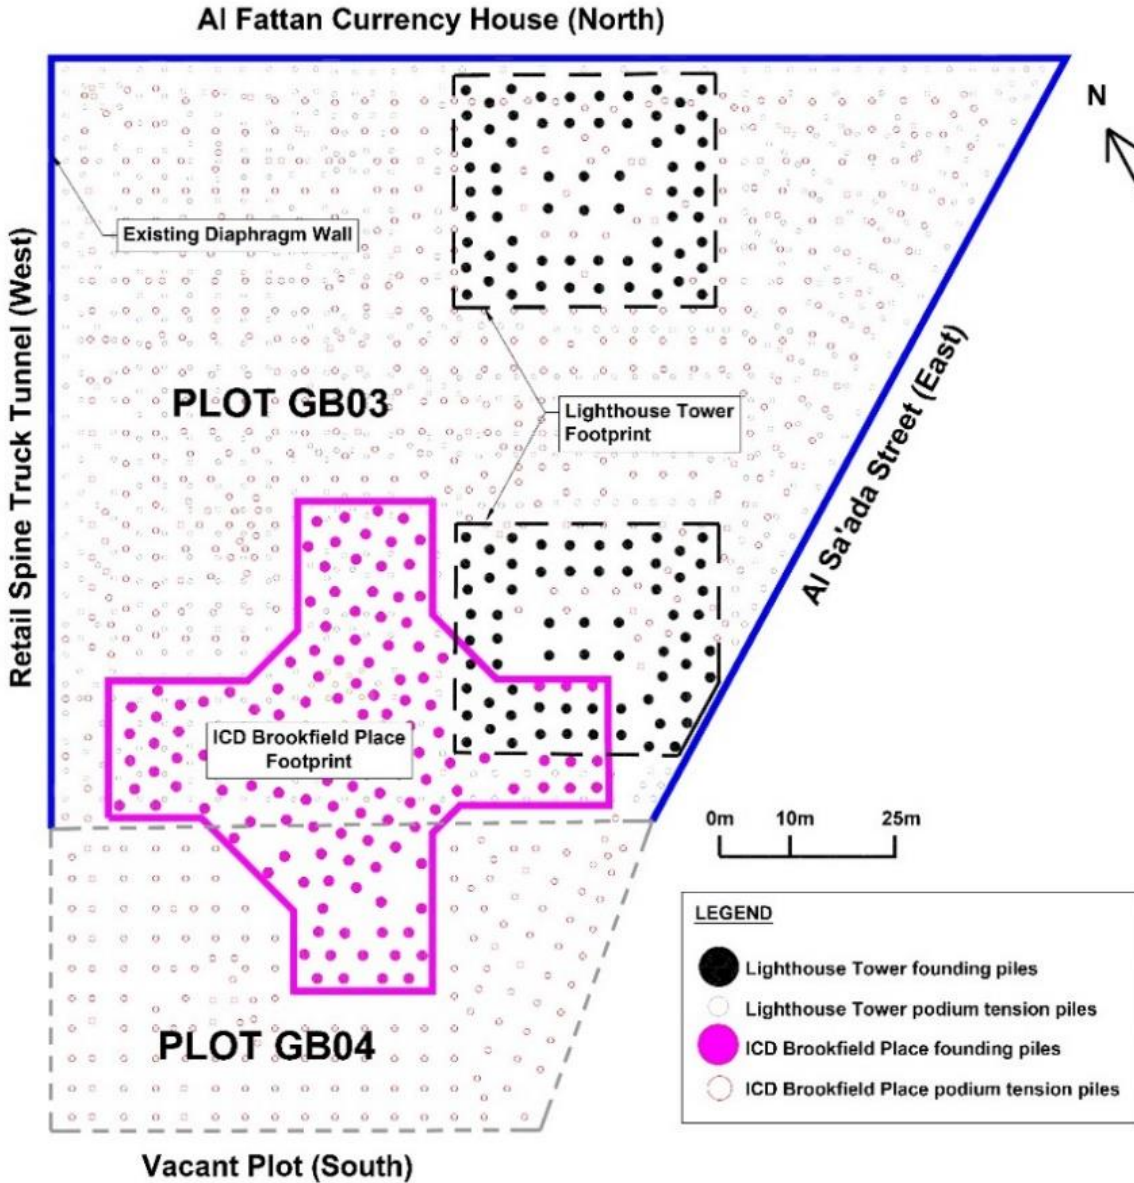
Shows extents of the former (Lighthouse) and ICD Brookfield Place Tower developments
